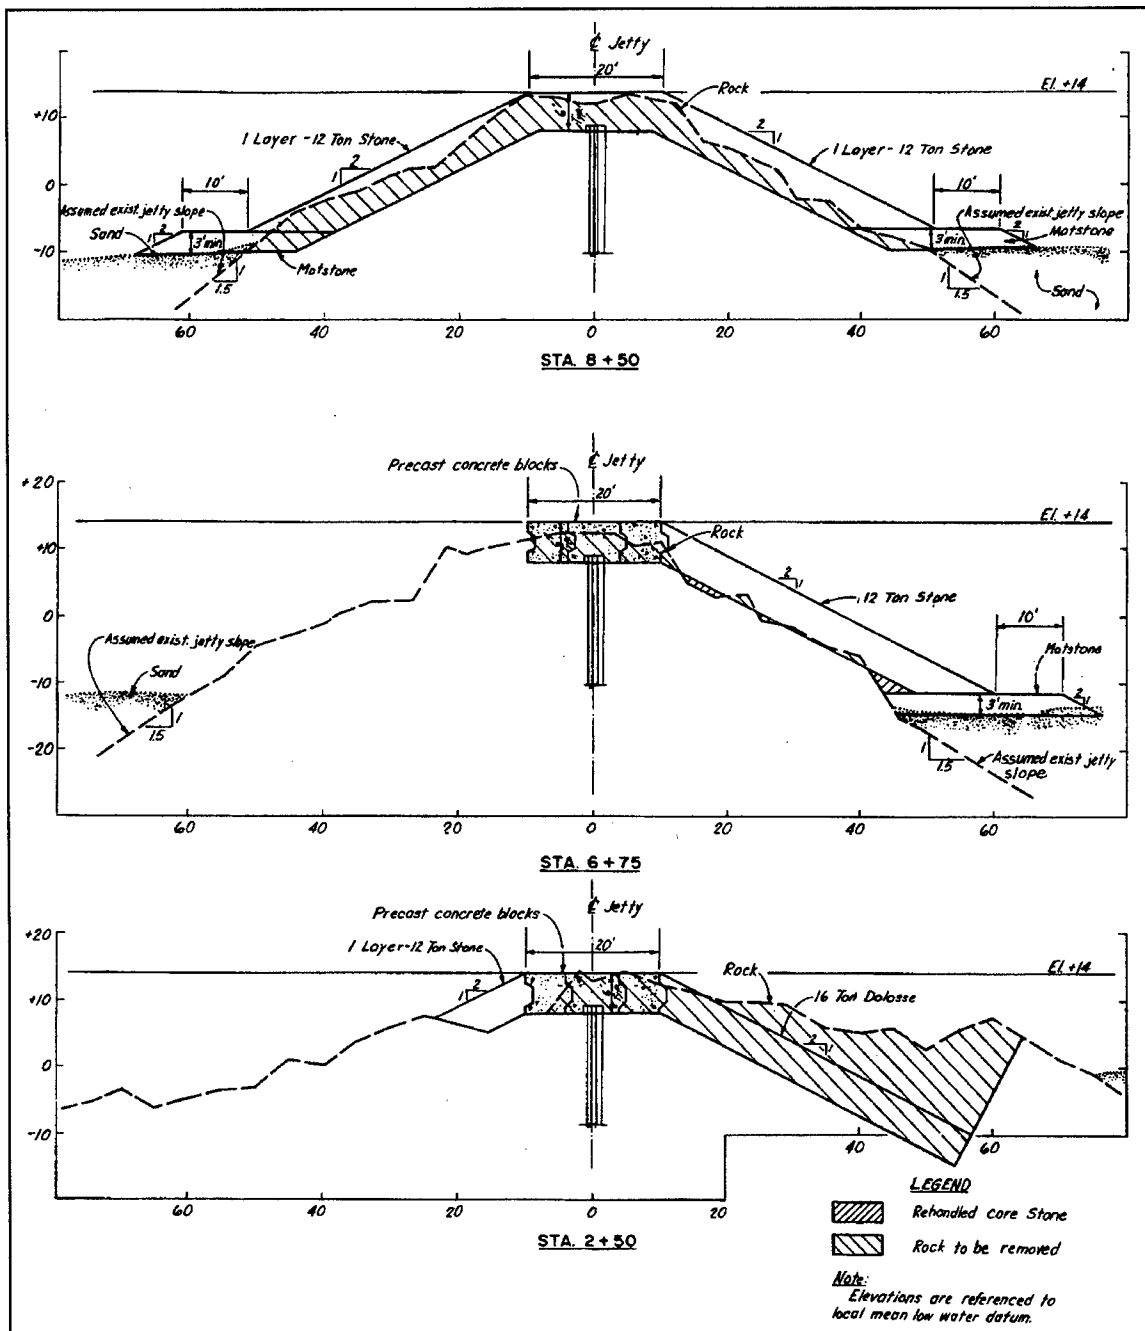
Construction drawings of north jetty cross sections, 1982 rehabilitation
